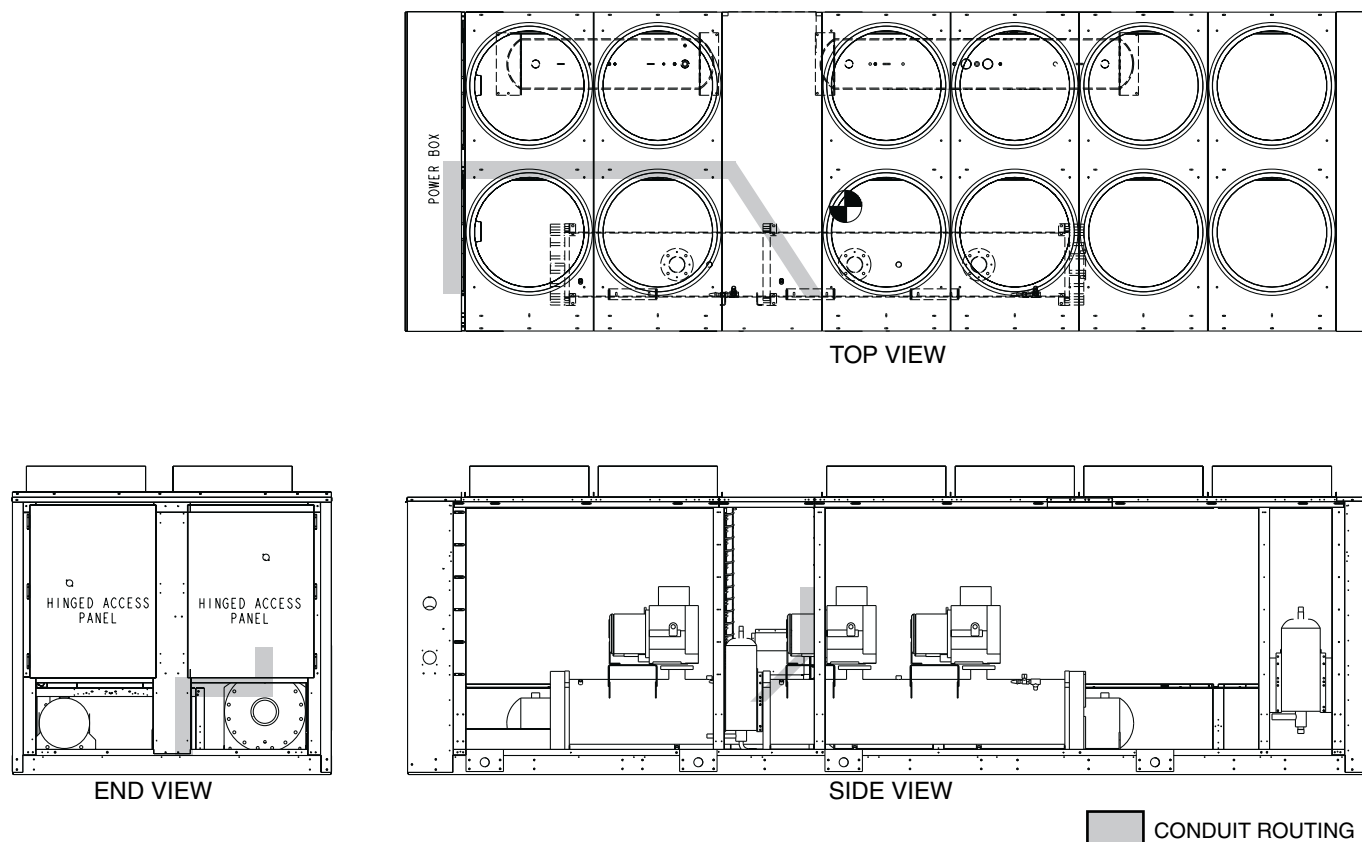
Typical Conduit Routing — 30GTN,GTR,GUN,GUR130-210
